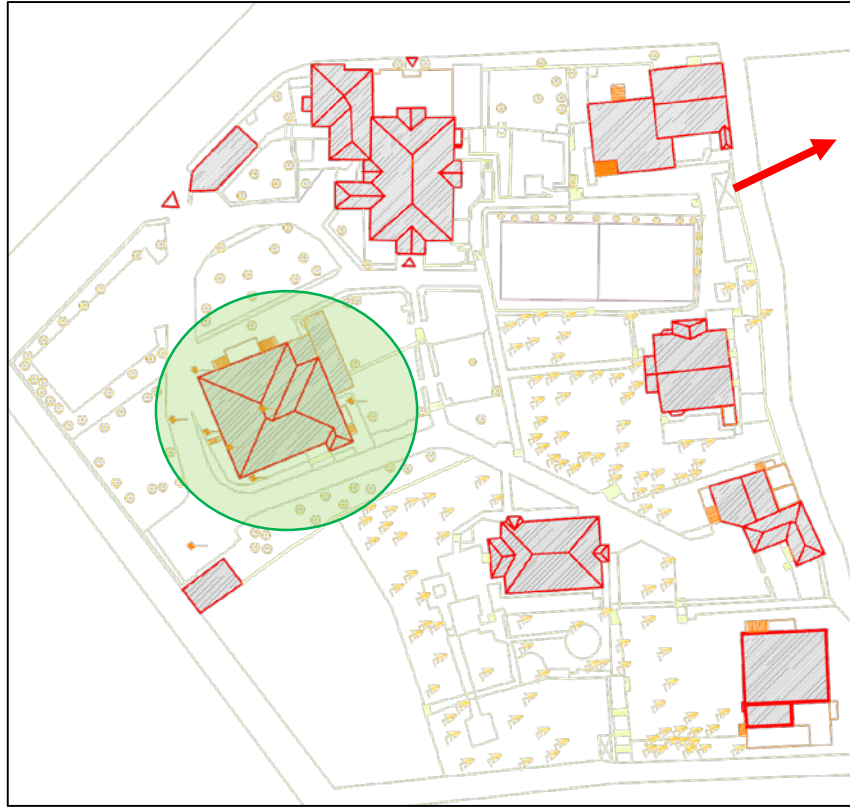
(b). Site plan of campus and the building examined (ERÜ general directorate of construction, 2017)
